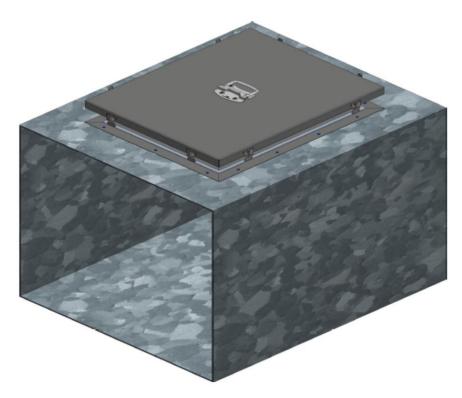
FIRESTOP Duct Hatch installed to rectangular duct
